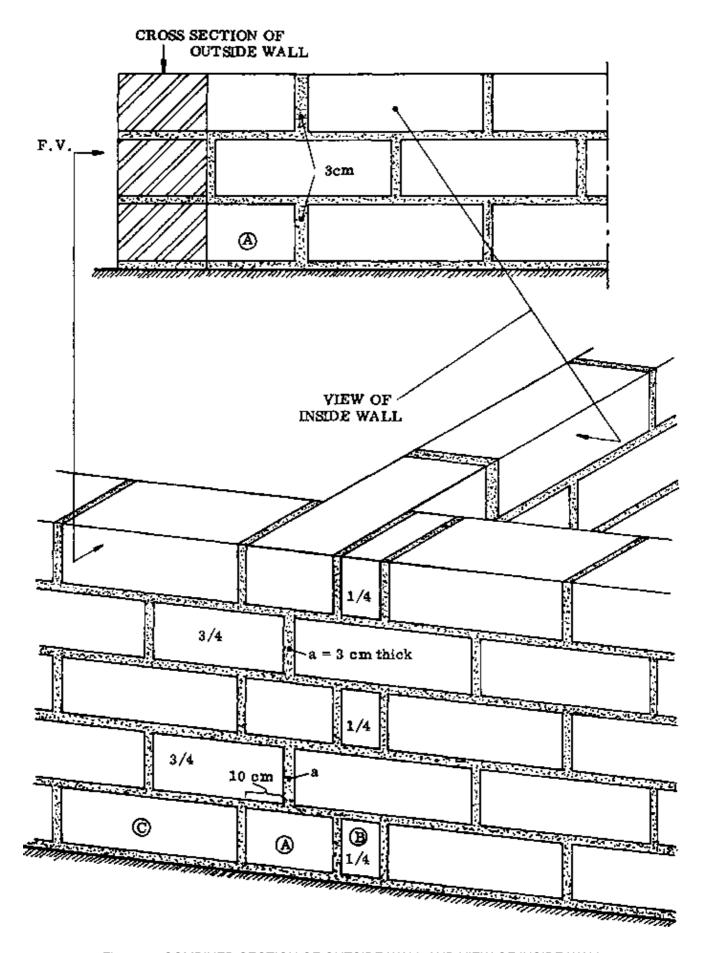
& 2 COMBINED SECTION OF OUTSIDE WALL AND VIEW OF INSIDE WALL
